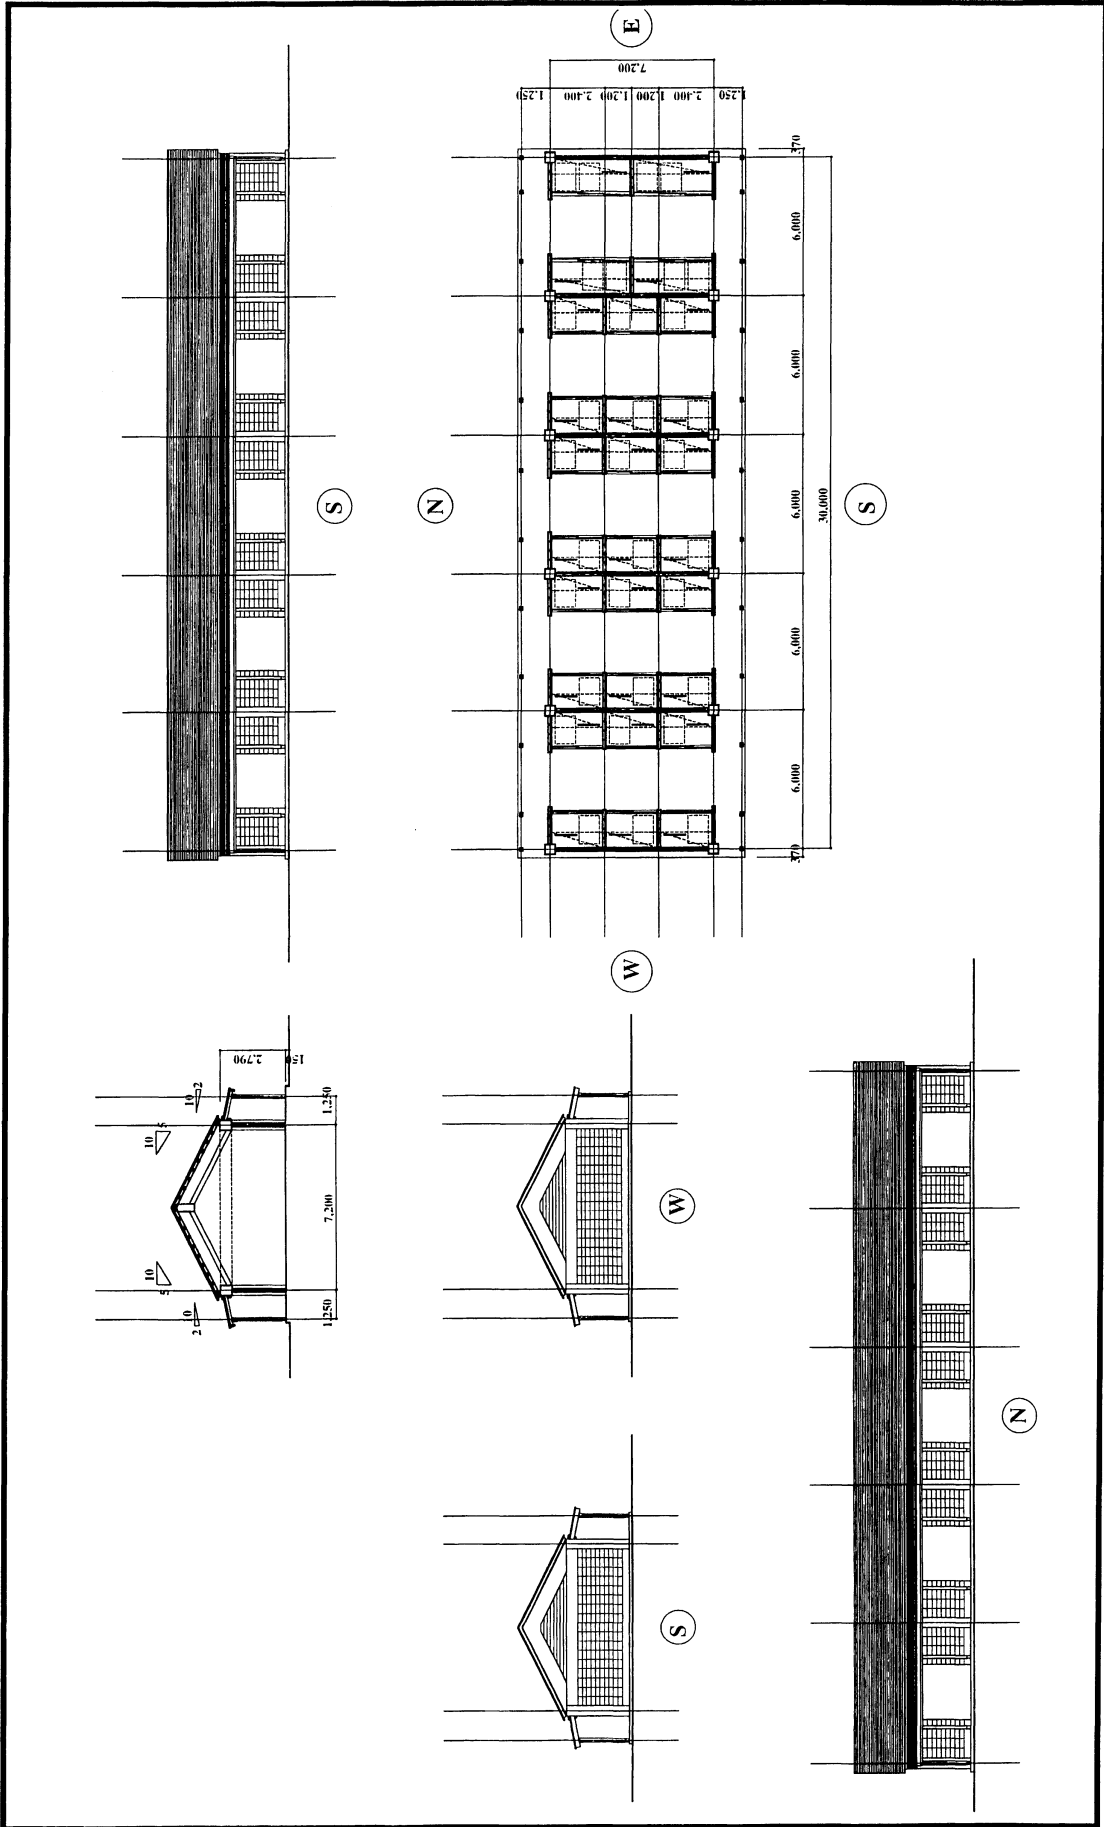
(2) Plan / Section of Gear Locker
